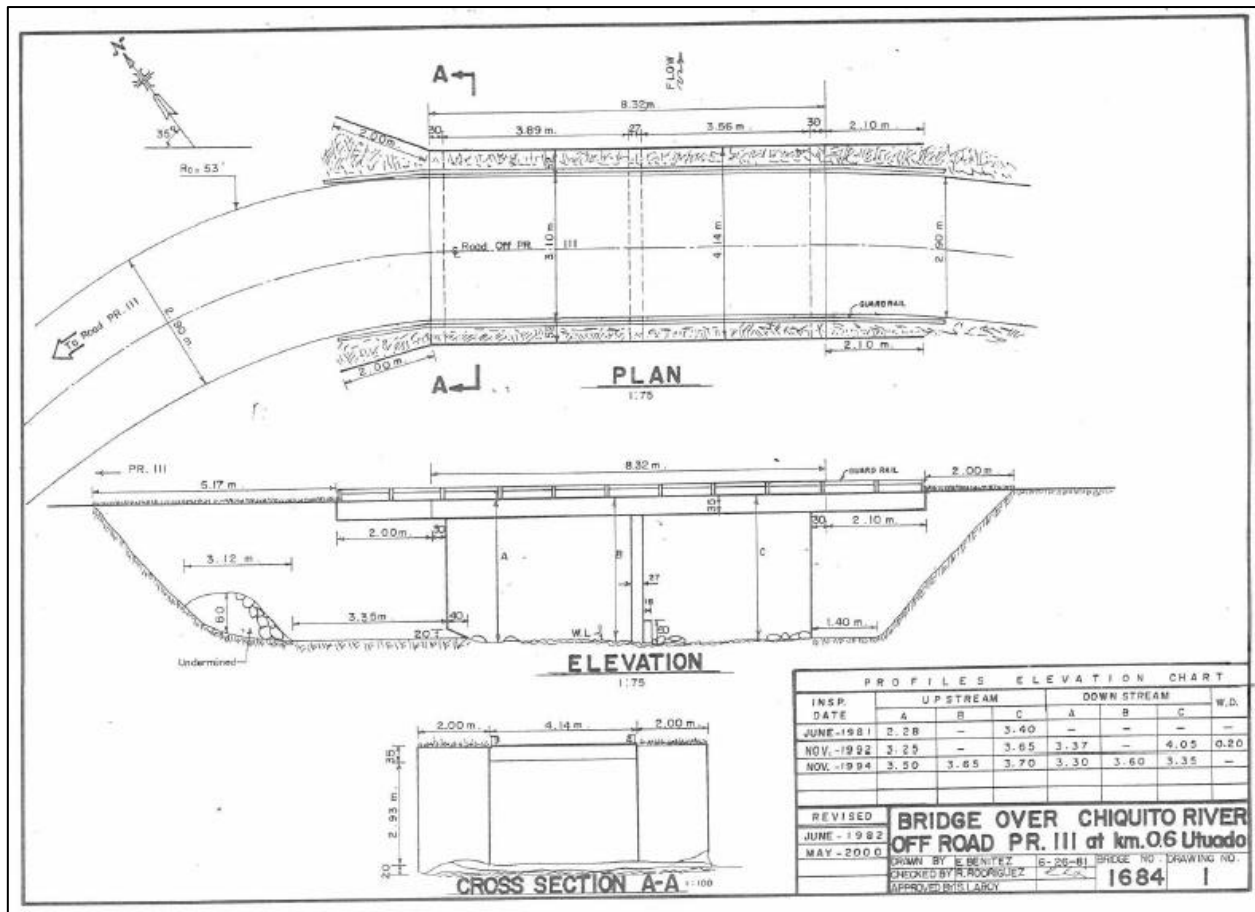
Bridge 1684 drawings (source: PRHTA)
